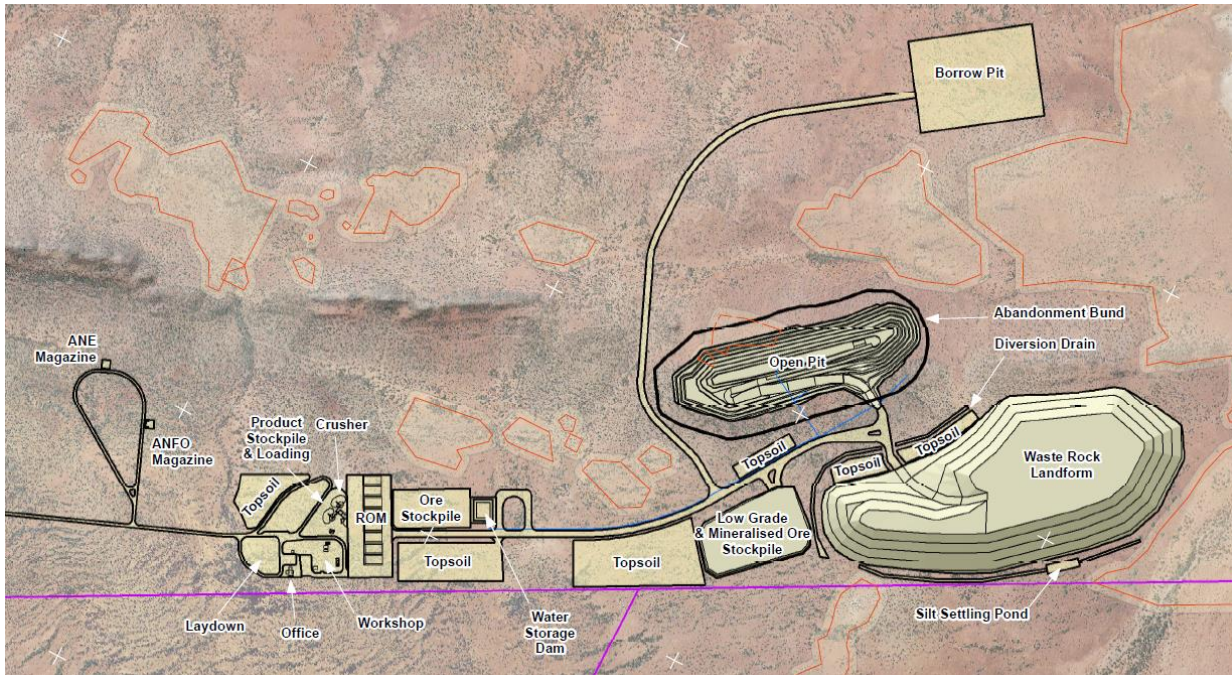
Beebyn-W11 Geneal Mine Site Layout (Overview)
